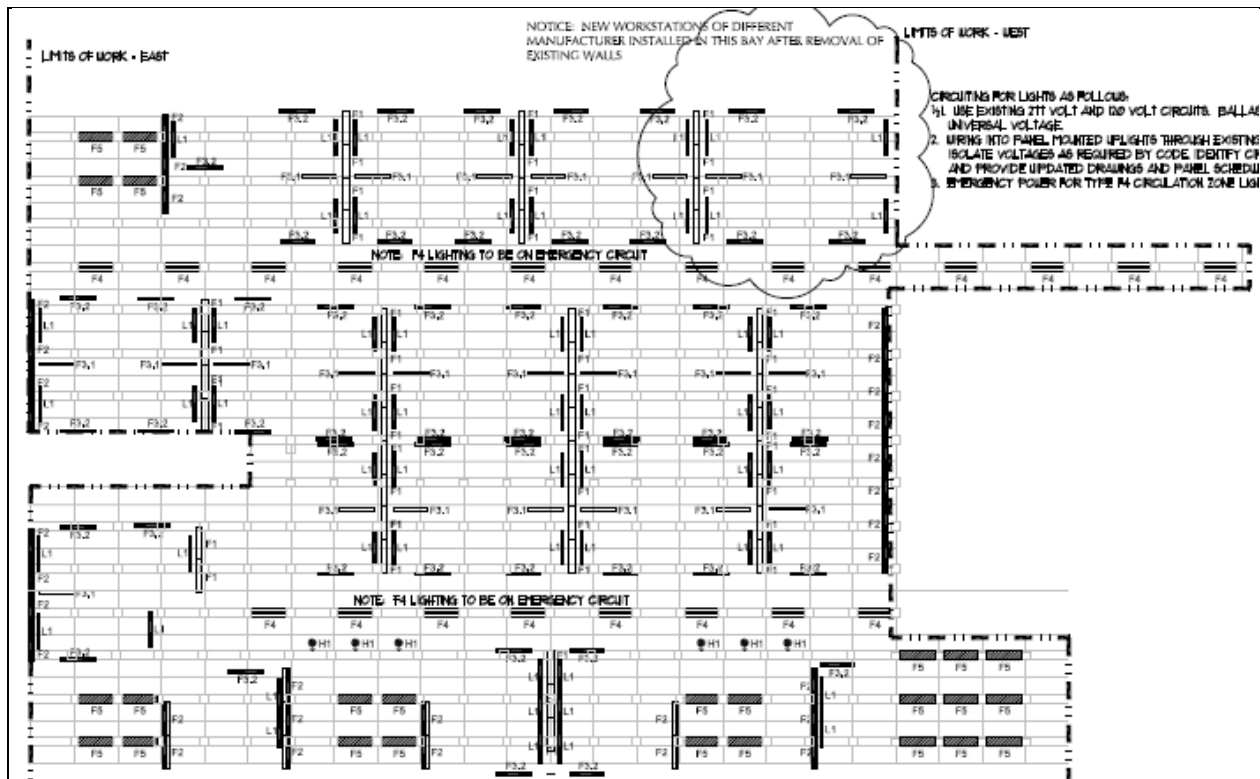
REFLECTIVE CEILING PLAN OF THE FBI OFFICE RELIGHTING PROJECT
